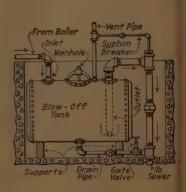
Typical blow-off tank with piping pertaining thereto.
